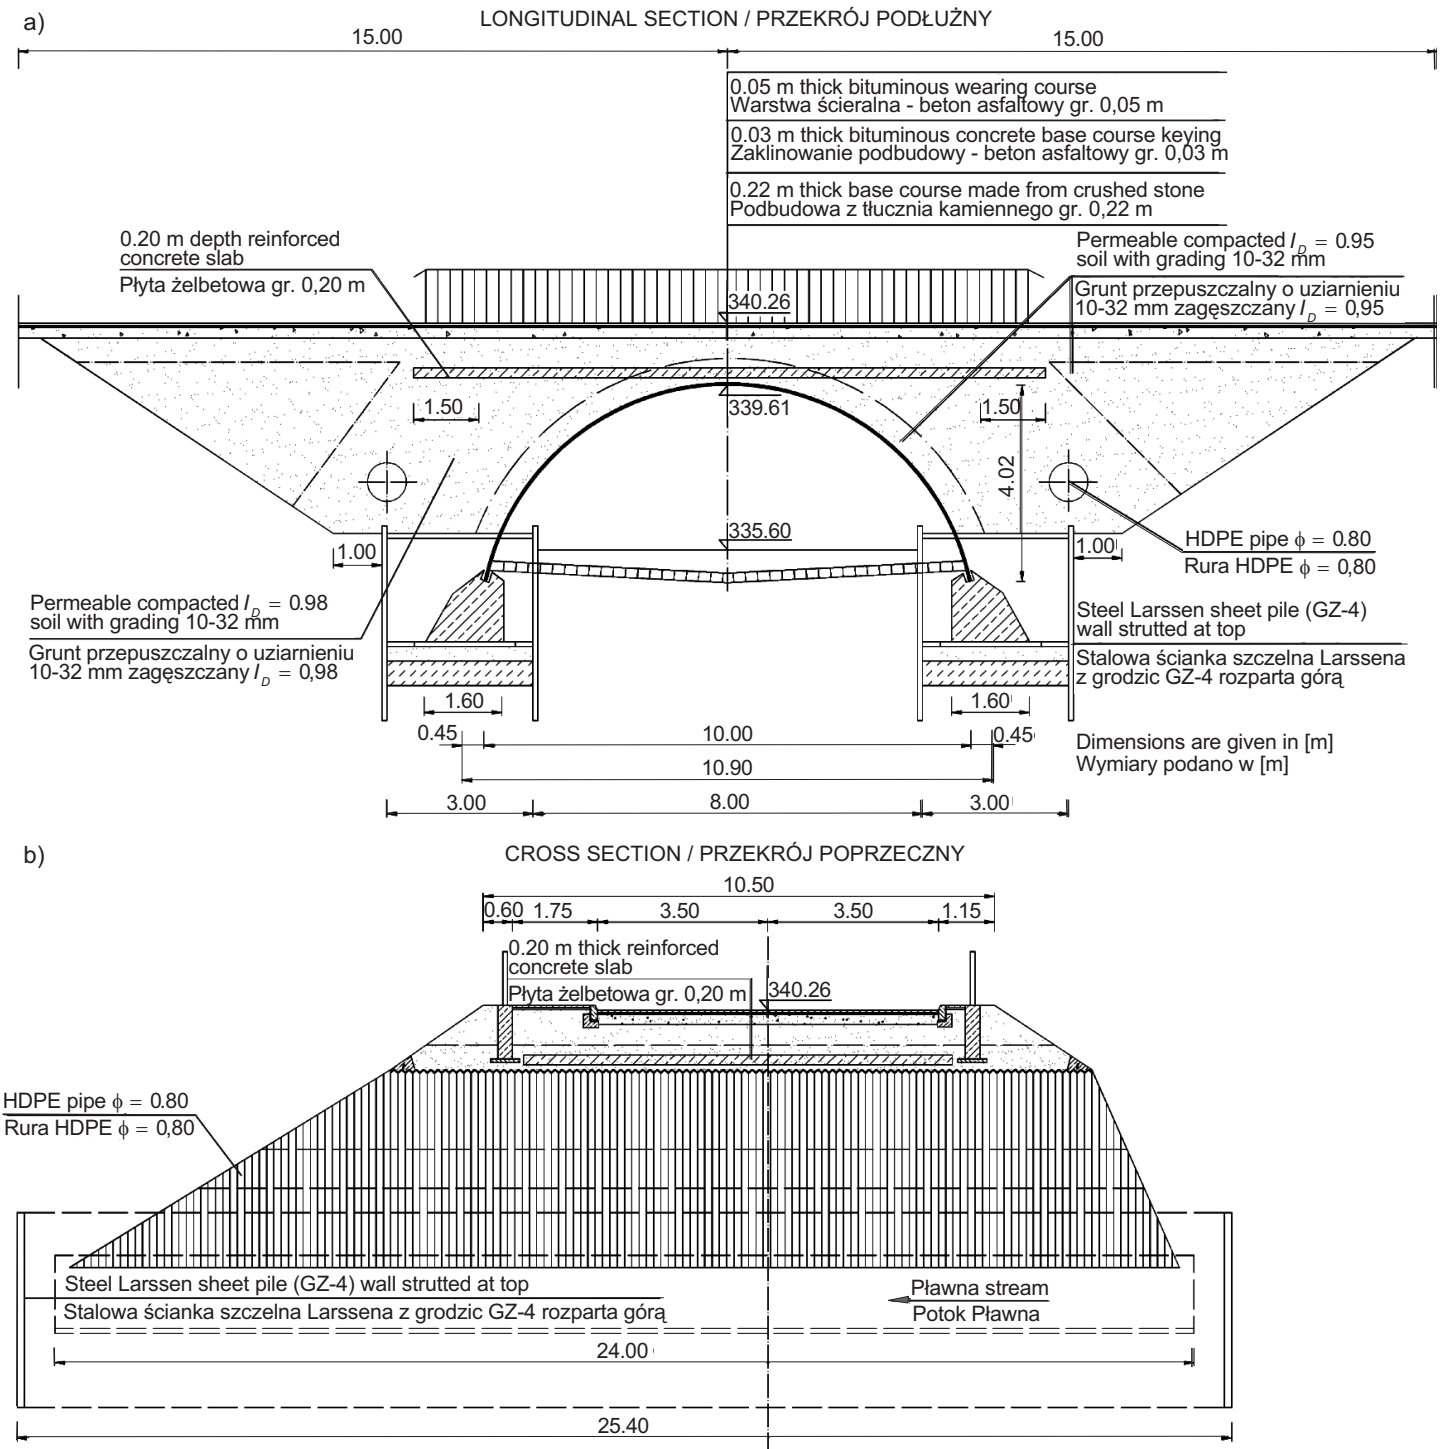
Soil-shell bridge: a) longitudinal section, b) cross section
